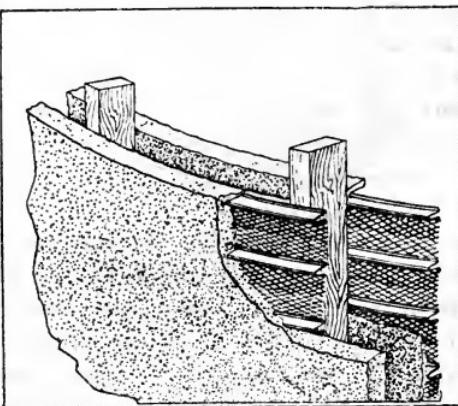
Showing double wall metal-lath silo.—Courtesy General Fireproofing Co., Youngstown.
